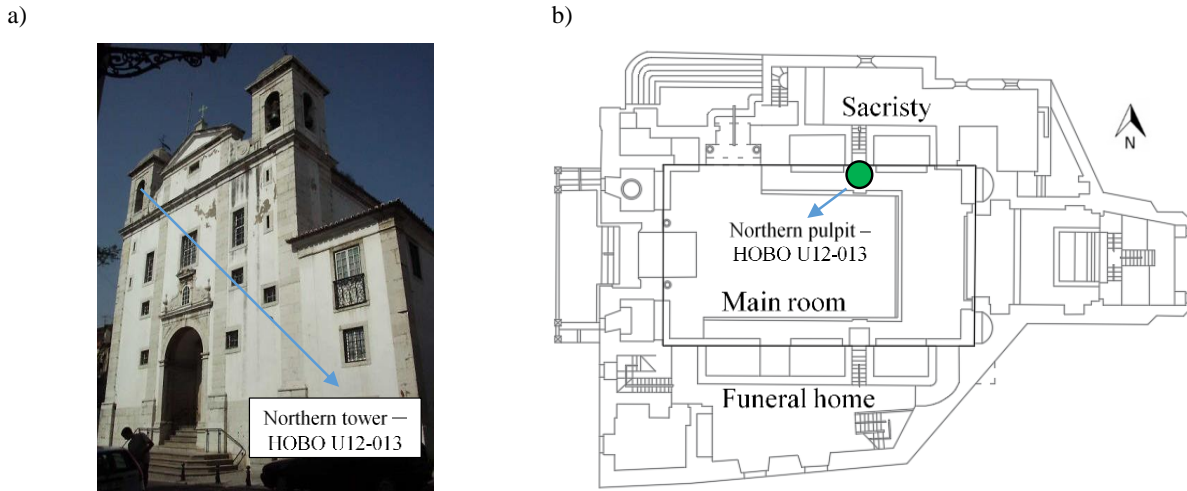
Southern façade of St. Cristóvão church (a) and horizontal plan with reference sensor (b)
